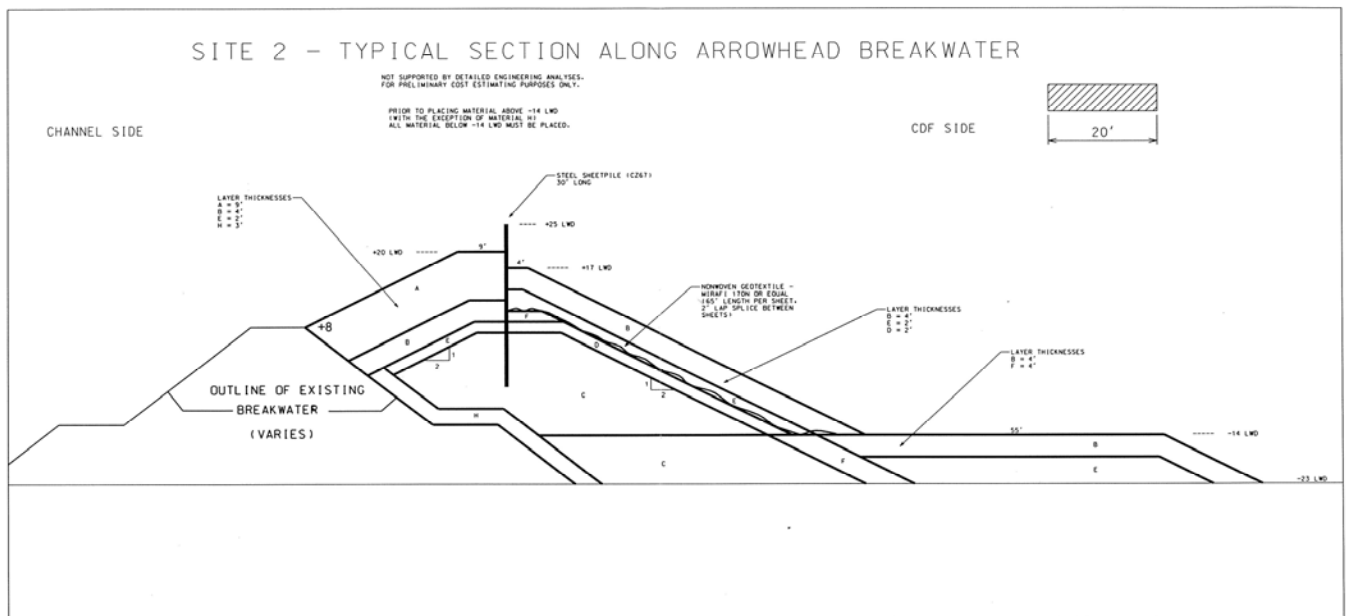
Site 2 Typical Cross Section in Open Water
